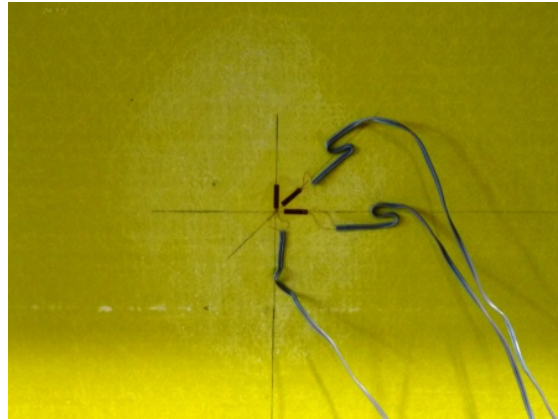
Full-scale flexural failure tests: I400 profile — strain gauge rosette used in for specimen P400-2.
